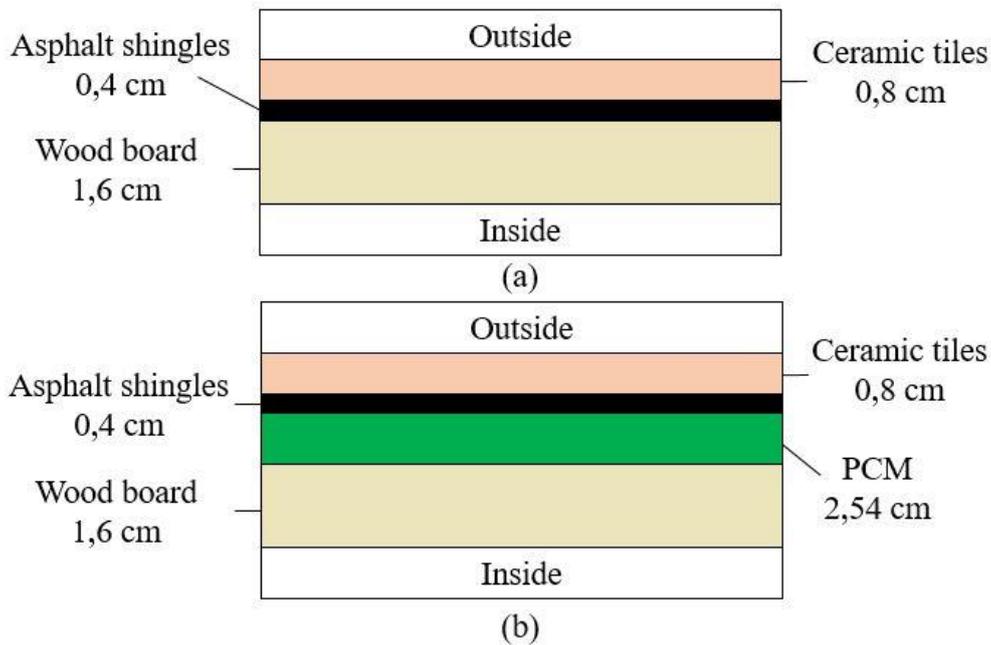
Roof construction type (a) without PCM and (b) with PCM
